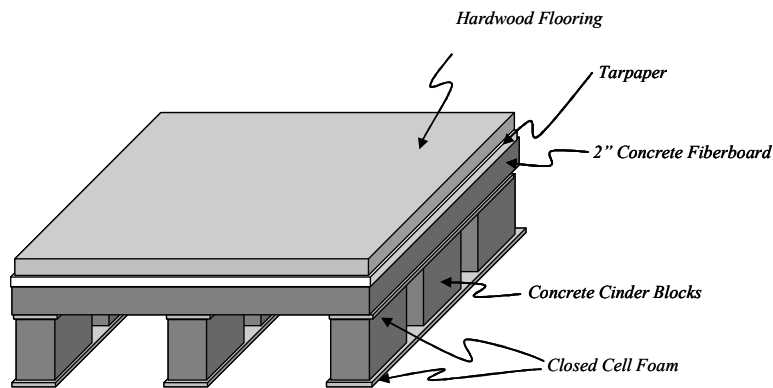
(b): Hardwood flooring / tarpaper / concrete subfloor / floating installation (Sample 23) and glue-down installation (Sample 25).
